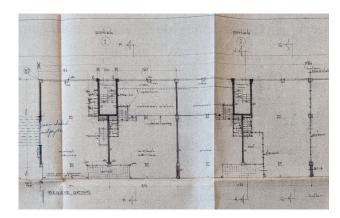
Block IV: Base Ground - Combination of Wall and Column Structure
